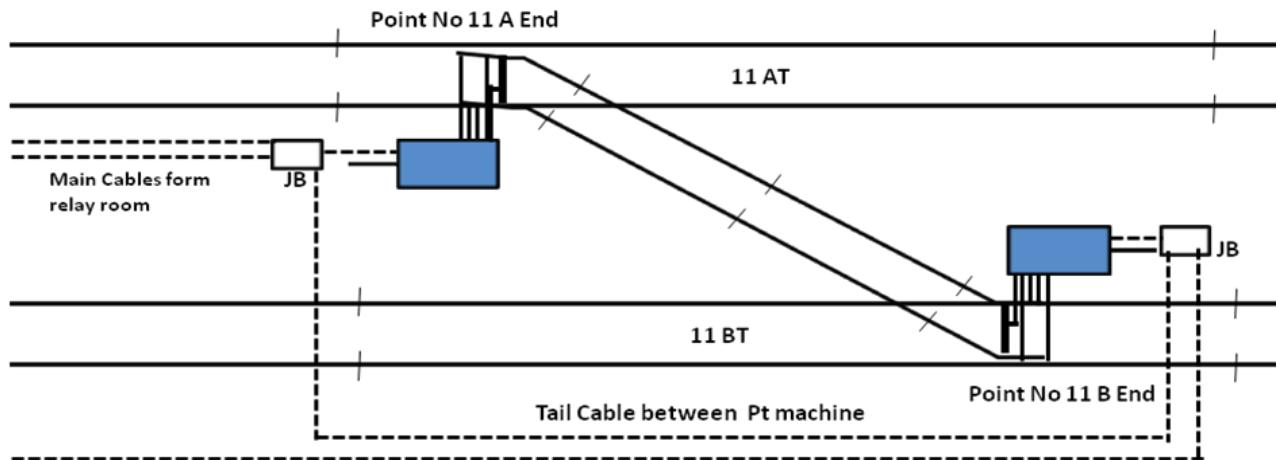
POINT LAY OUT WITH RIGHT HAND MOUNTED POINT MACHINE
